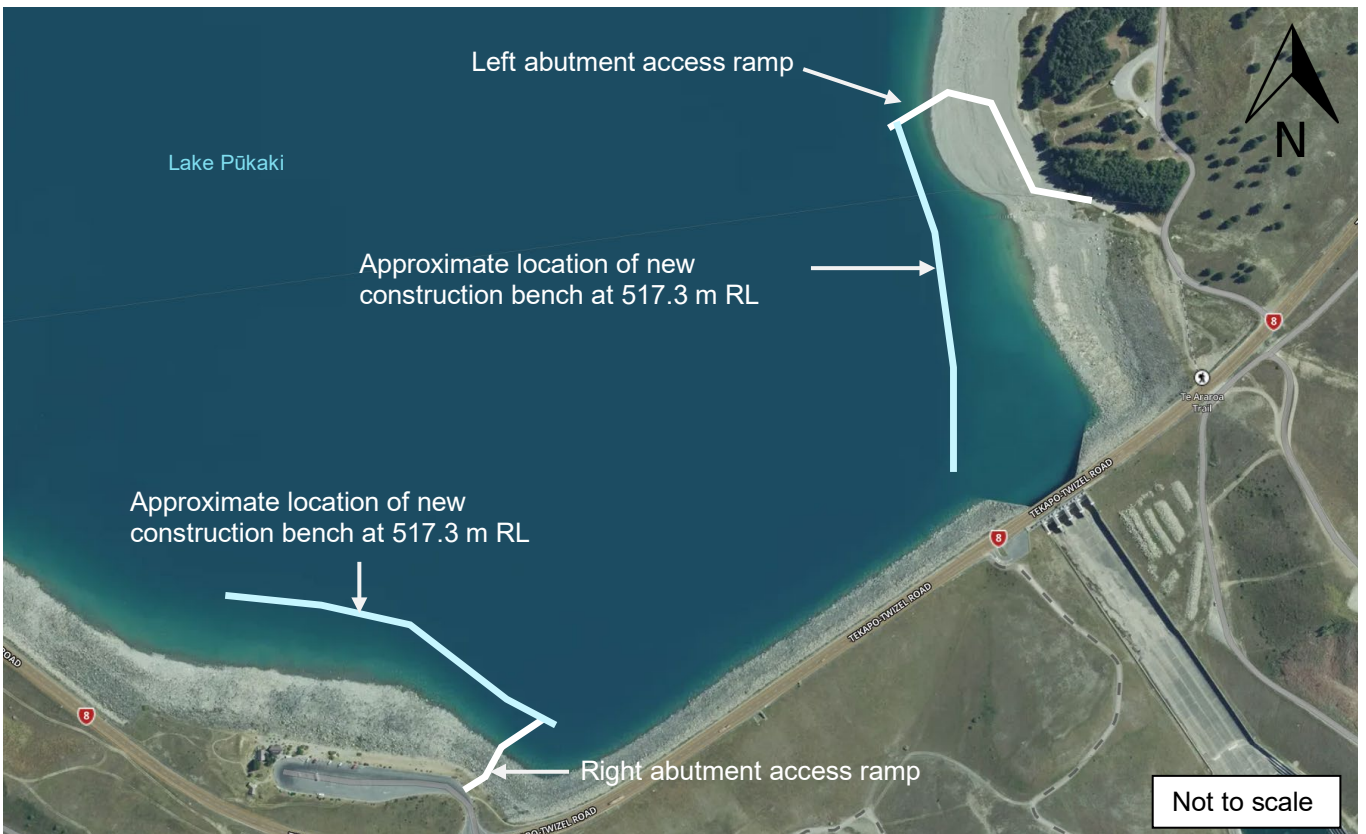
Site plan (abutments) – Tranche 1 - and indicative 517.3 m RL construction bench
